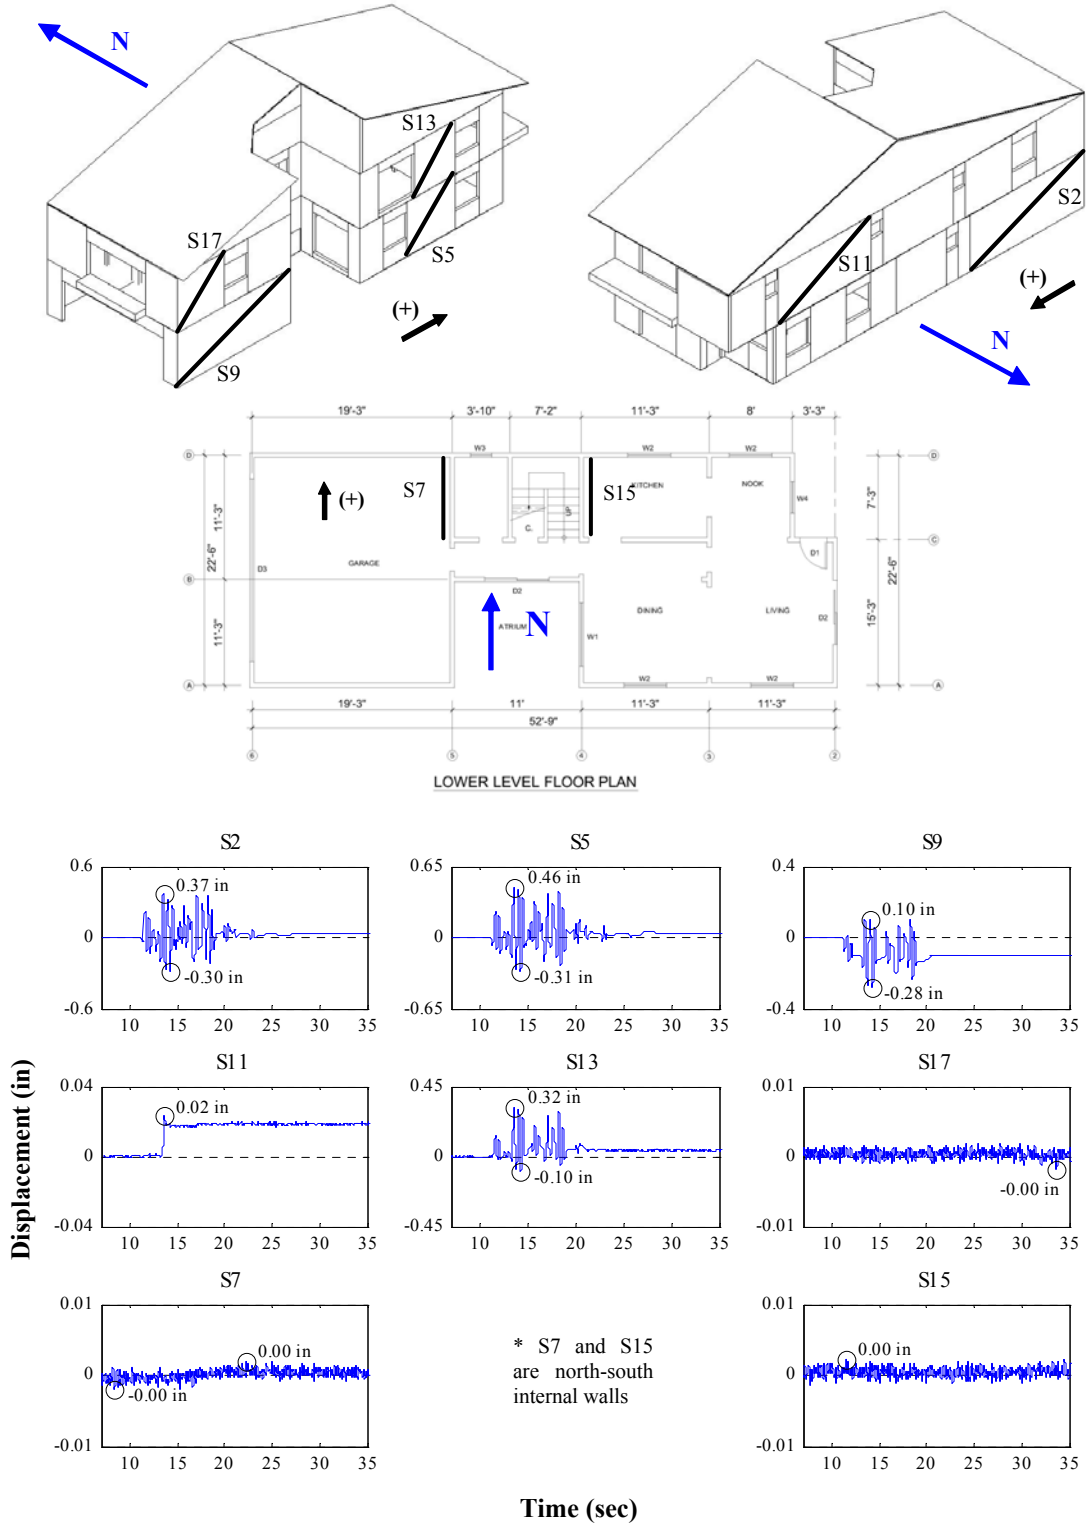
Wall deformations of east-west internal walls for Test NWP2S28
